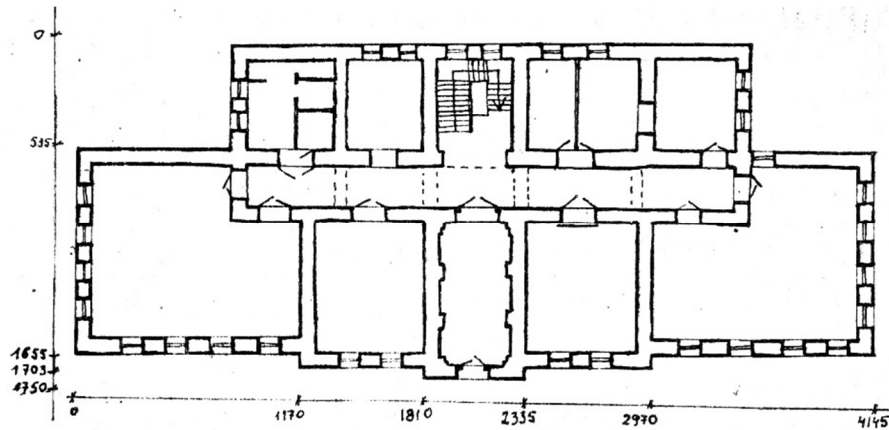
Plan of the oldest part of the didactic building constructed in 1880.
